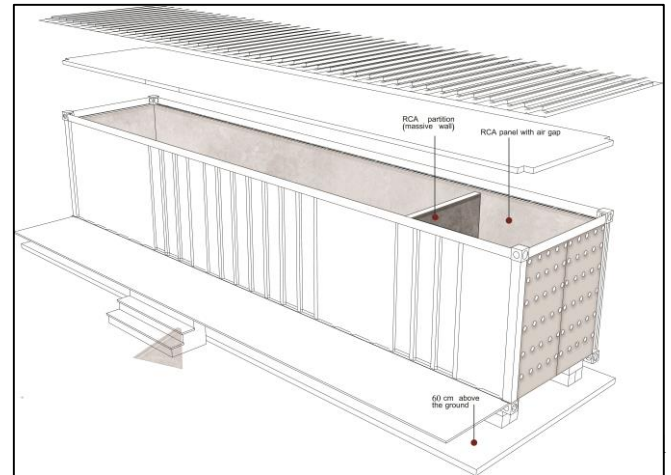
Renovation 3 model: Adding insulation to the walls and elevating the structure above the ground
